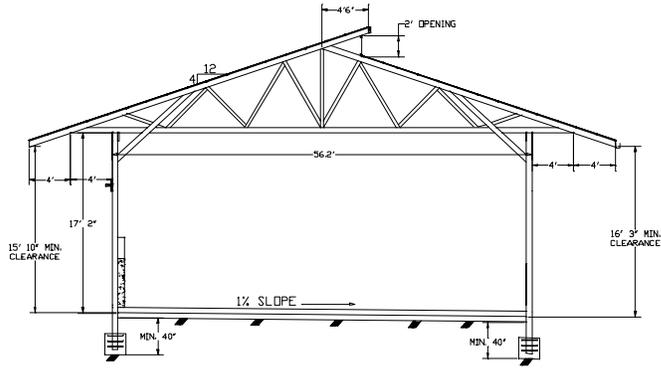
shows a side view, plan view and cross section of the biodrying shed. The building was designed with a high overshoot roof, open walls, and four foot eaves to provide good ventilation while keeping the process protected from precipitation. Manure and recycled compost can be loaded from either side, although preliminary trials have shown that a side delivery manure spreader can build a six foot pile 40 feet long.
